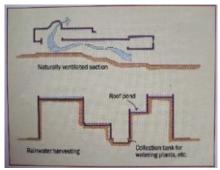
Section Explaining Natural Ventilation and Rainwater Harvesting in the Roof
